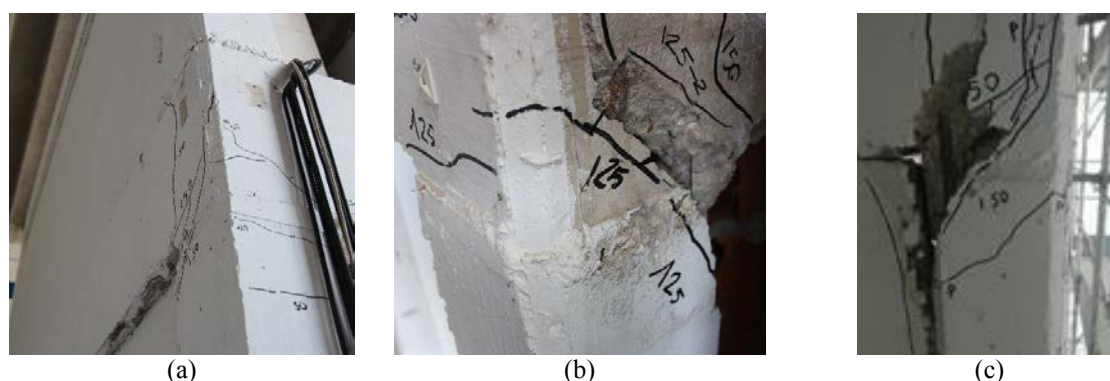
Damage evolution of the unstrengthened second-floor slab-column joints: (a) after test 14; (b) after test 18; (c) after test 20.
